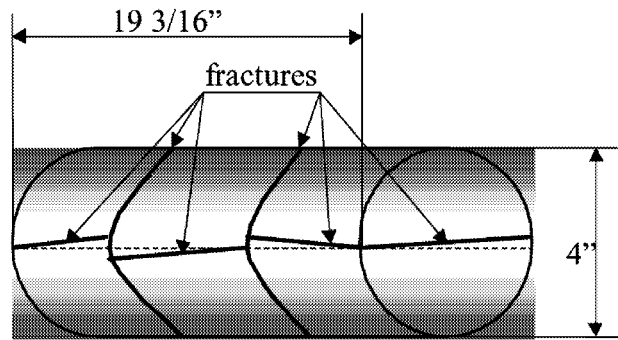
Sketch of the fractures split on Core #8
